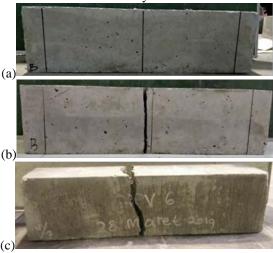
(a) Specimens before the test; (b) normal concrete without cold joint after test V-0); (c) fiber concrete after the test (V-3)
